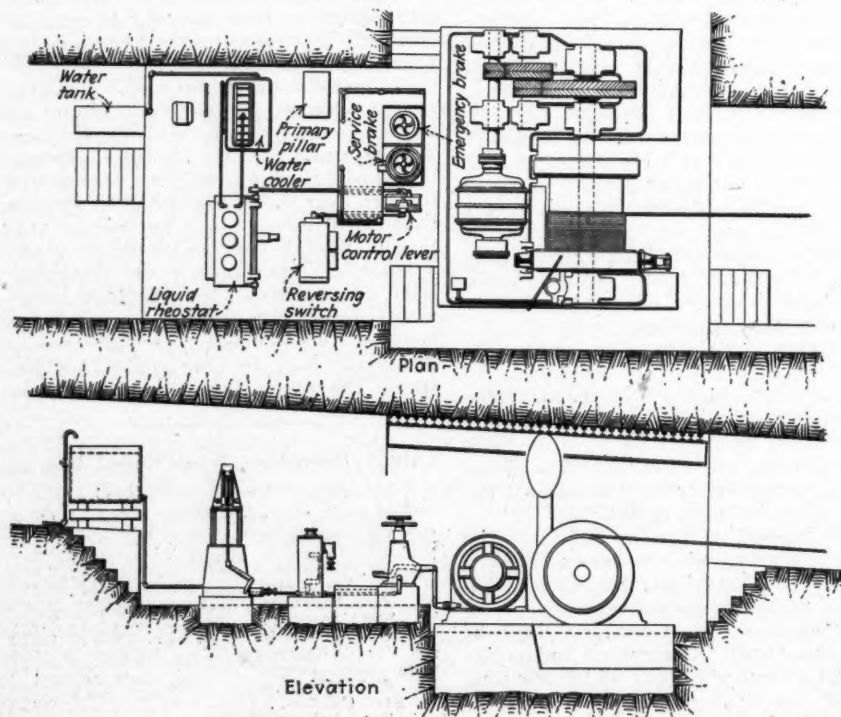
Plan and Elevation Showing Hoist Room Layout
